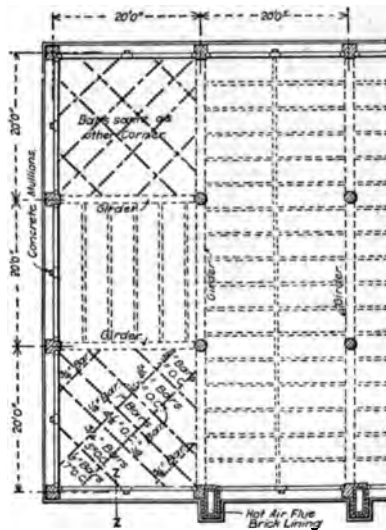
Part Floor Plan, United Shoe Machinery Co.'s Factory.
